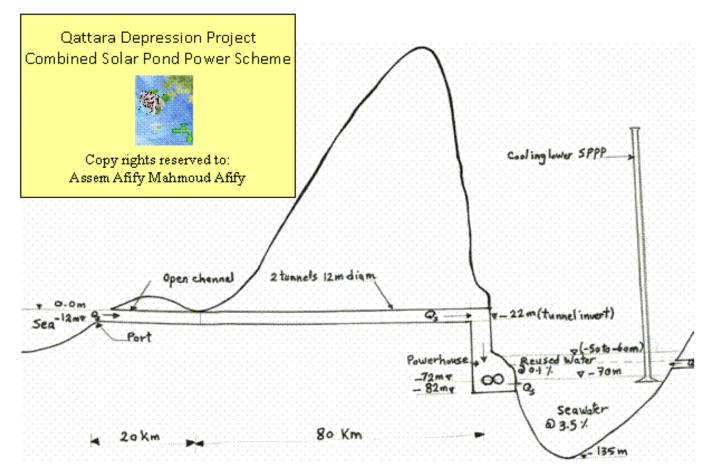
Cross section showing the configurations of two hydropower plants and a Solar-Pond-Chimney power plant.
